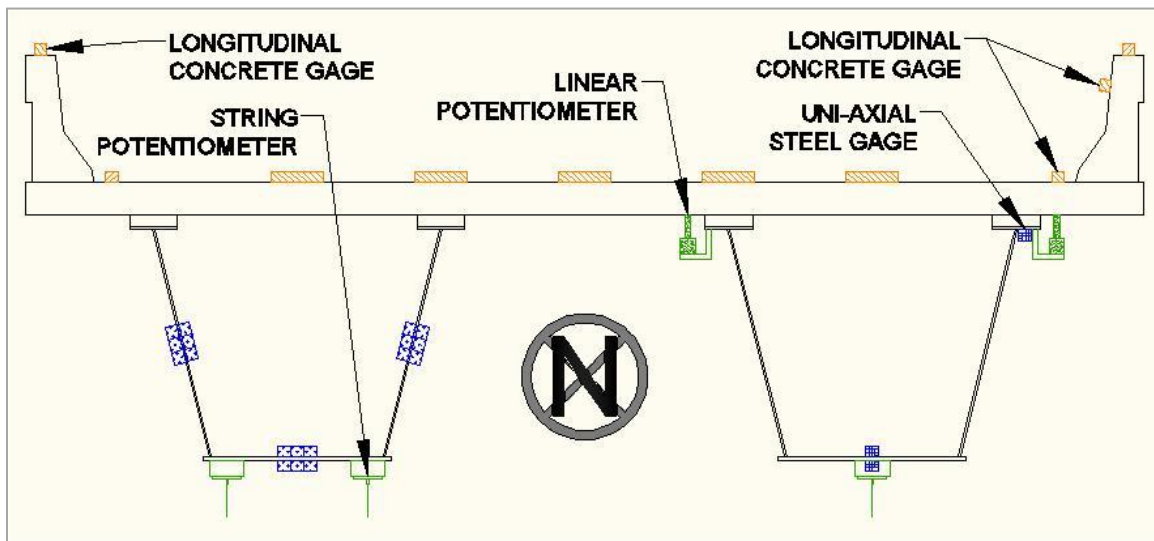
A typical instrumentation plan of a cross-section for Test 3 [Neuman, (2009)]
